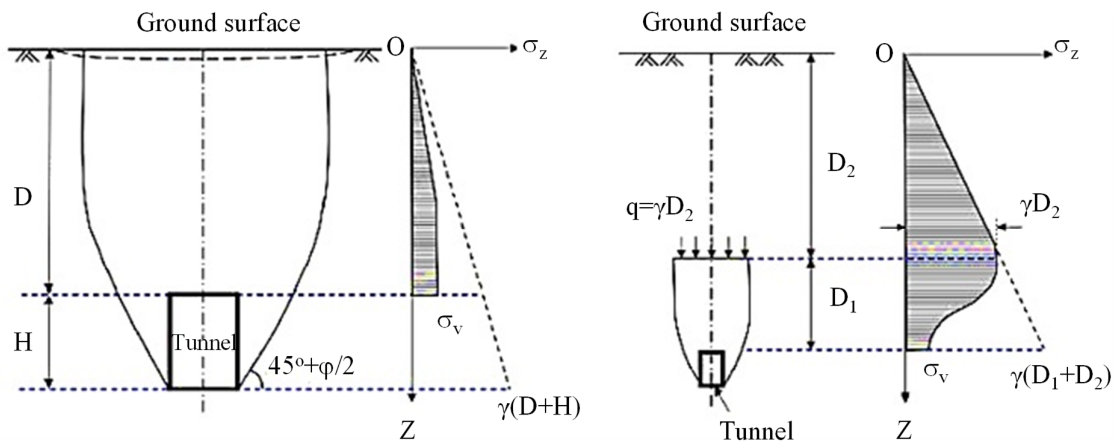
Vertical stress profile at centerline after tunnel excavation [16].
